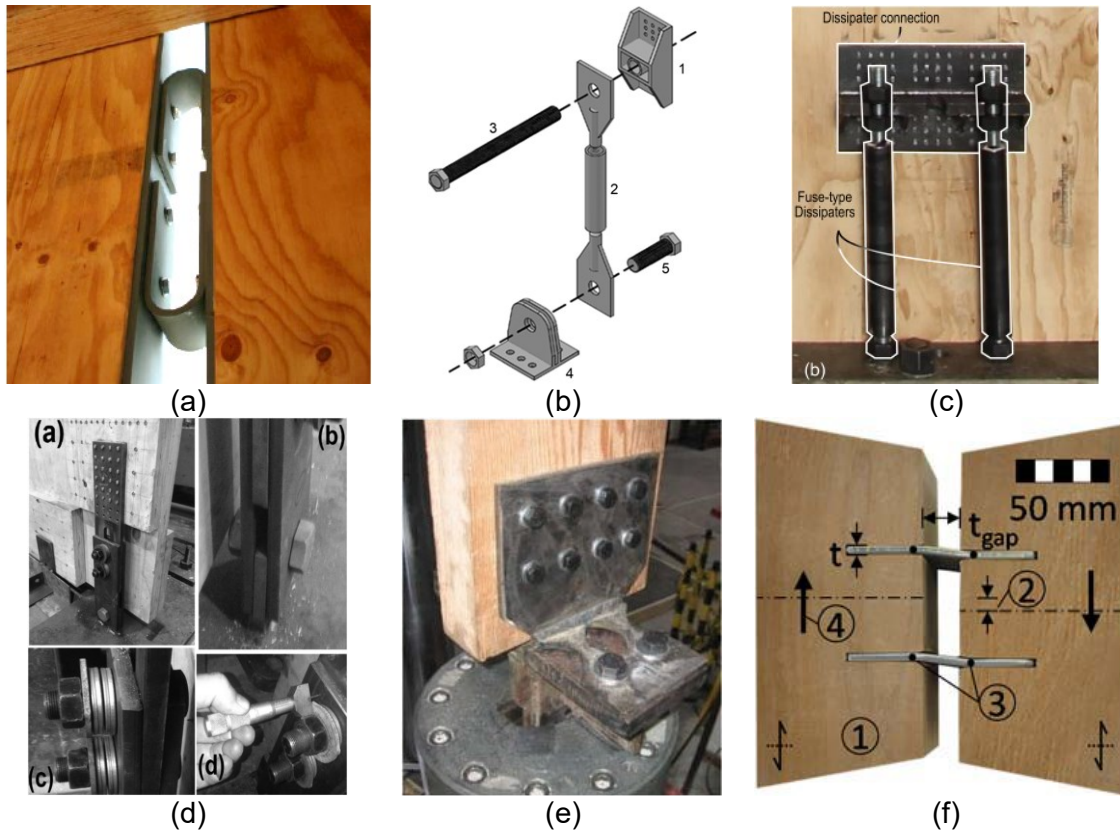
Examples of innovative connections for CLT structures: (a) UFP [3.28]; (b) Fuse-type dissipater [3.37]; (c) Fuse-type dissipater [3.38]; (d) Slip-friction connector [3.39]; XL-Stub [3.42]; (f) Steel plate dissipater [3.43].
